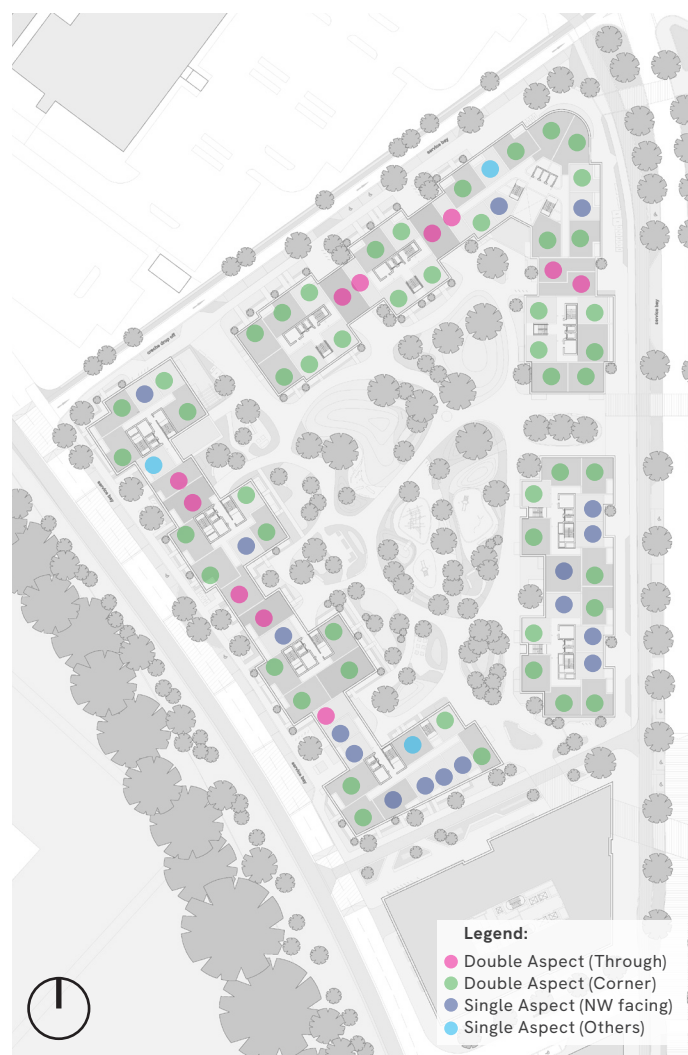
Single Aspect Study of proposed illustrative typical residential floor layouts
